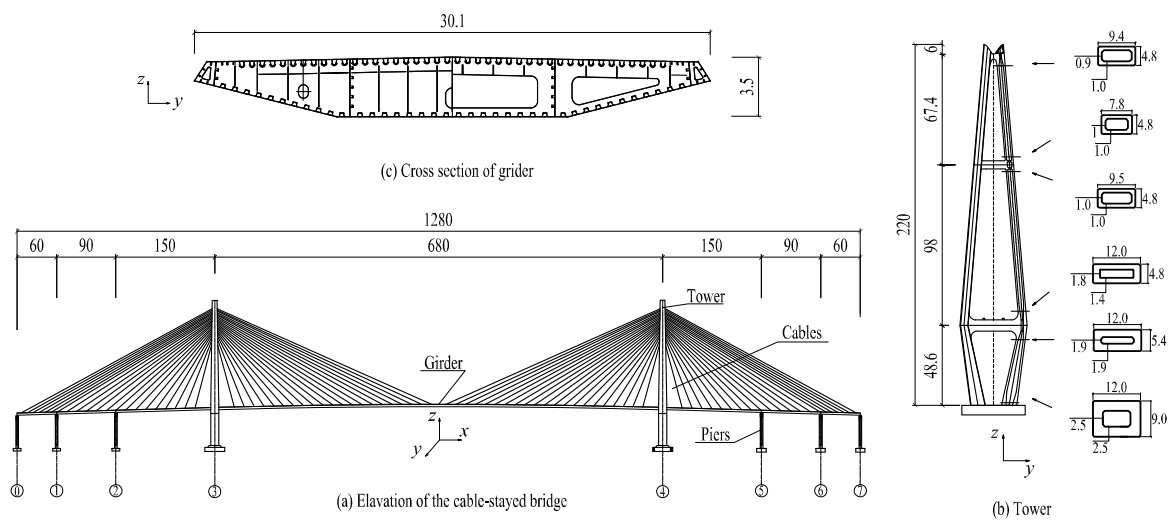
(a) Elevation of the CSB; (b) the cross section of girder; (c) the main tower.
